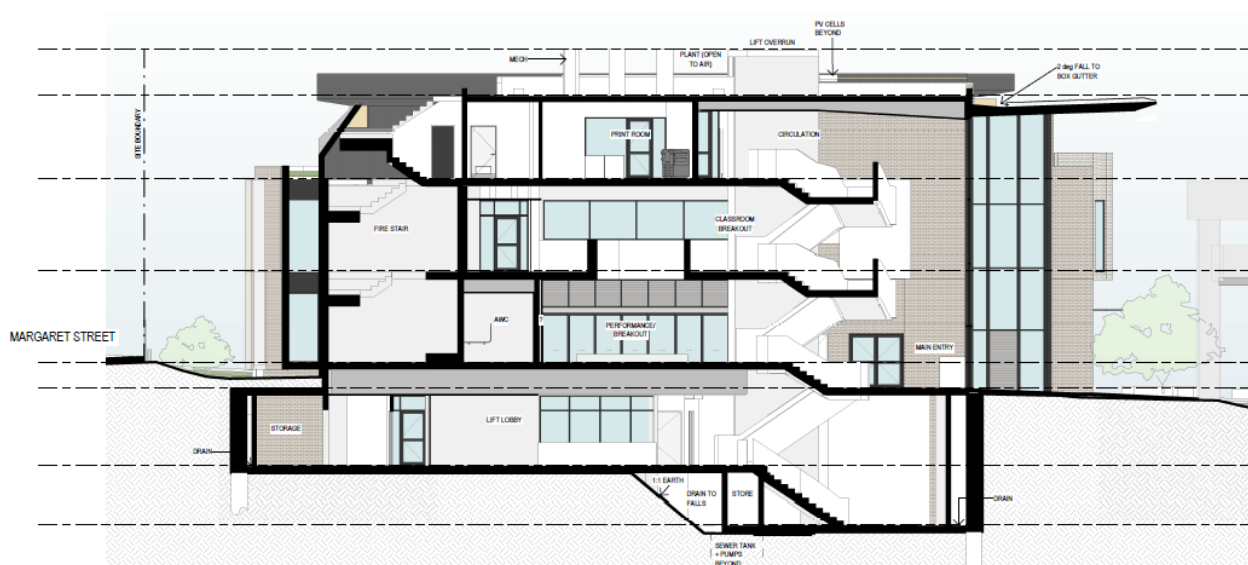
Proposed north-south section (with Margaret Street to the left)
